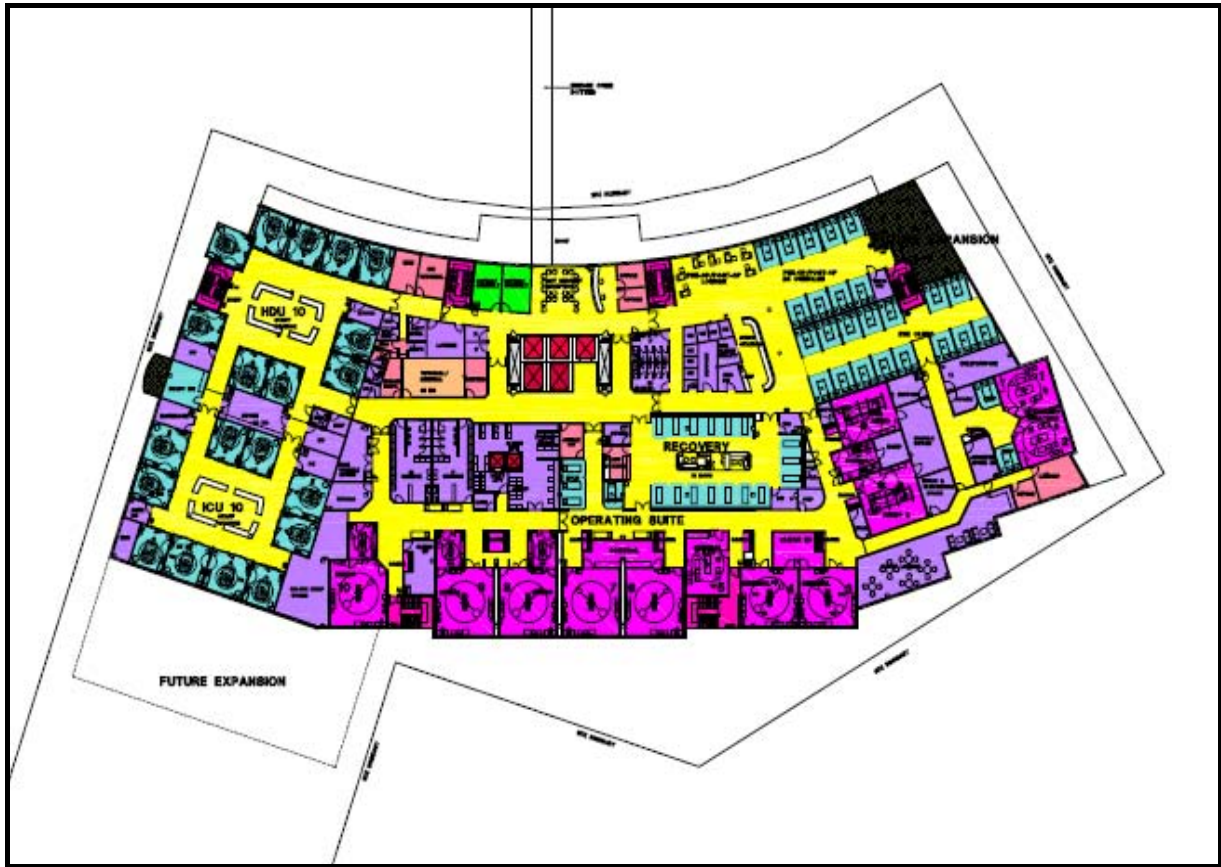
Typical Floor Plan – Stage 1 (level 1)
